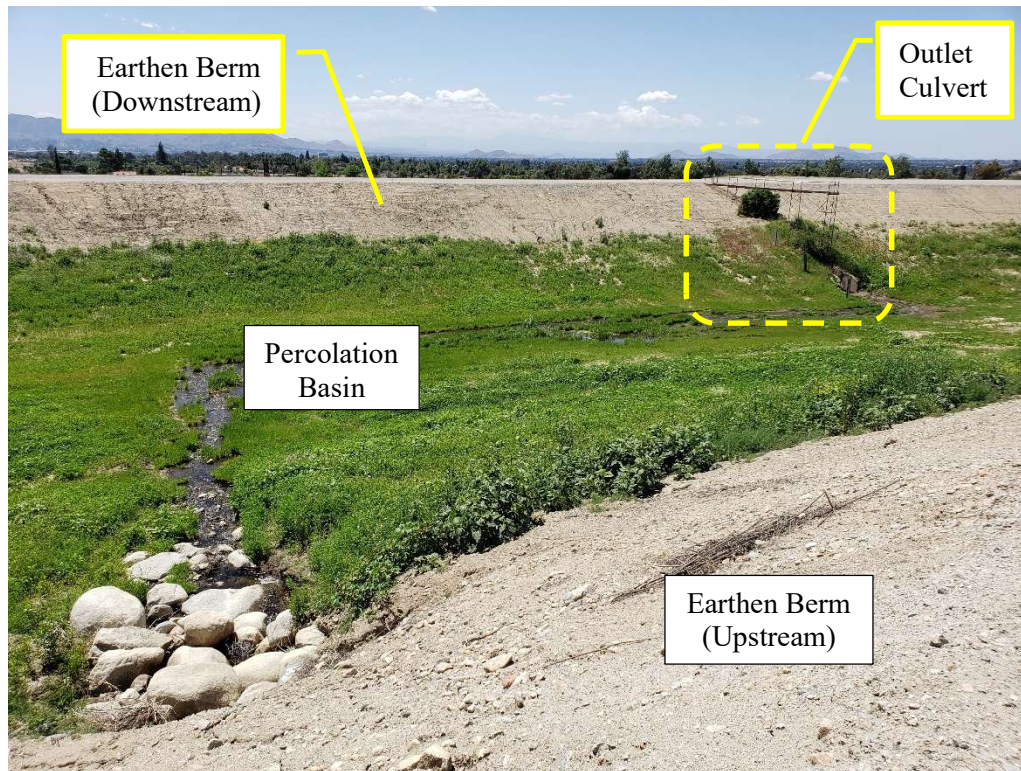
Typical Percolation Basin with Outlet Culvert
